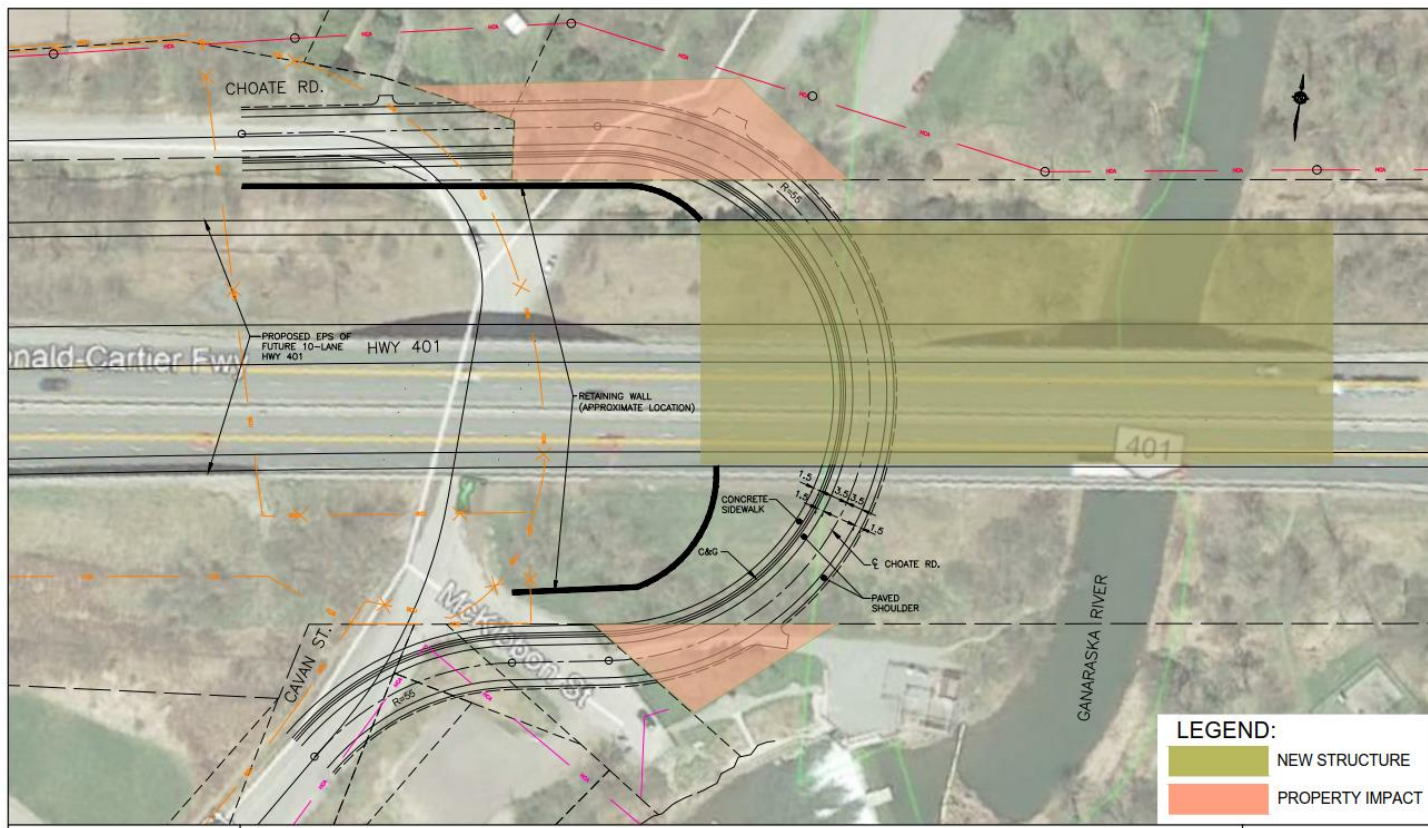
Choate Road and Ganaraska River bridges Alternative 3A
